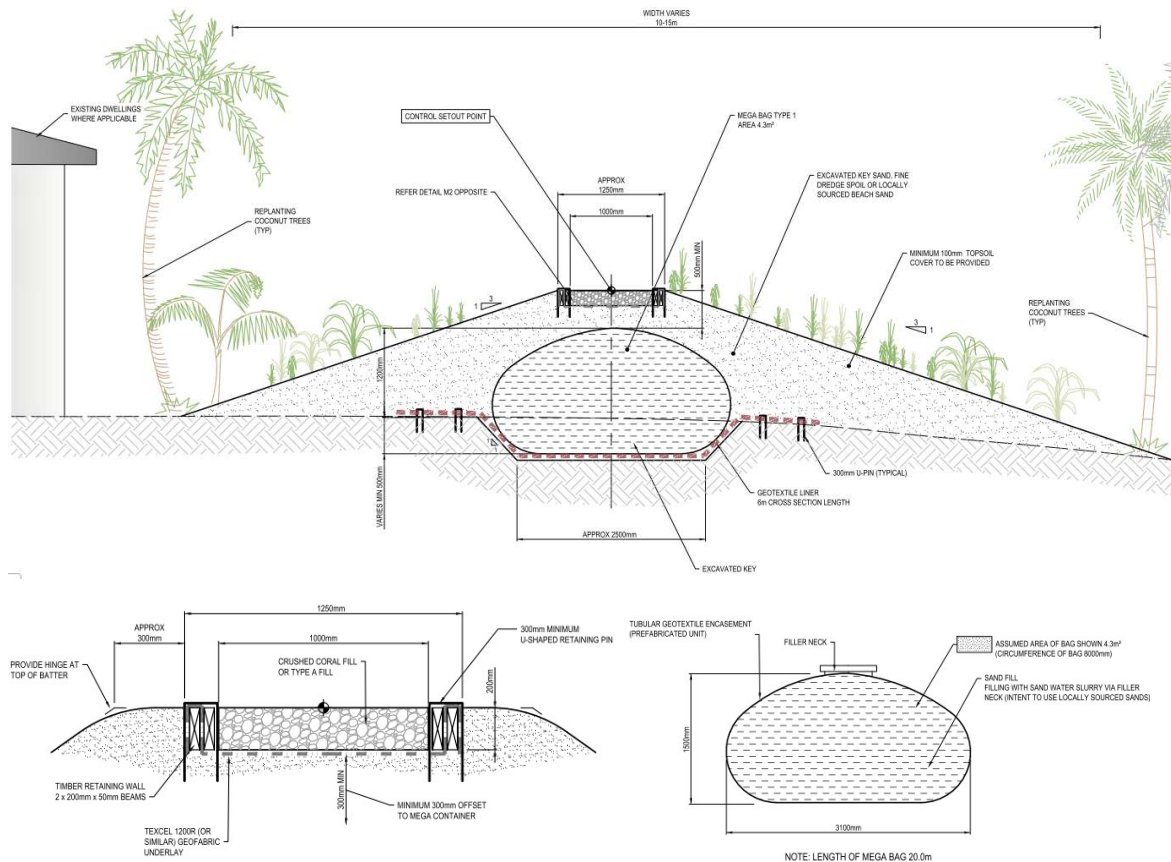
Site plan of the TCAP Nanumaga coastal protection design
